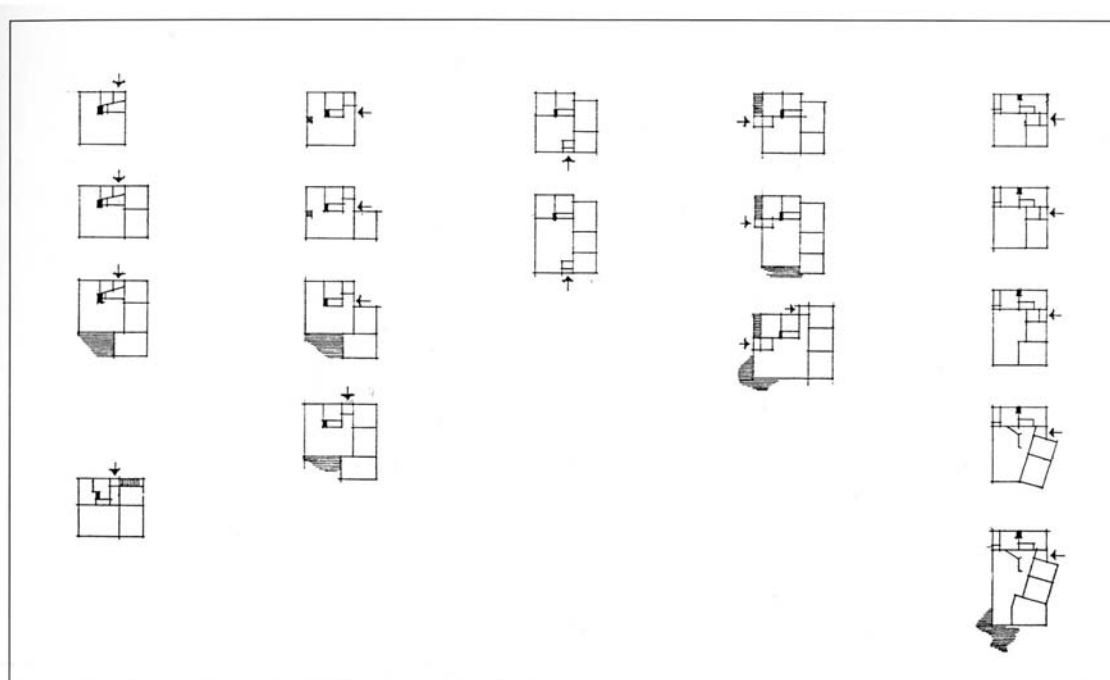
Various floor plan configurations of the AA-system houses [Schildt 1989]
